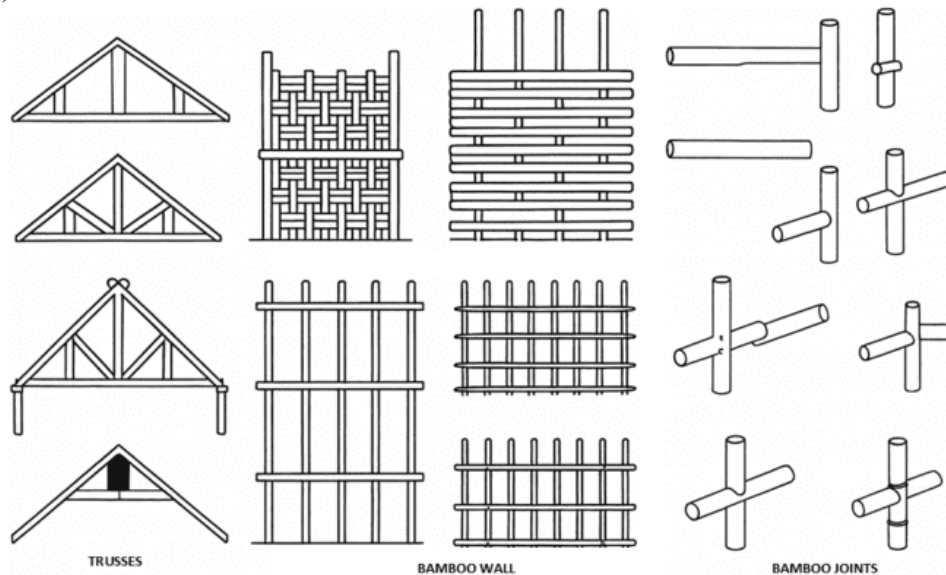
Construction details of bamboo stilt houses in Ziro Valley, Arunachal Pradesh.
